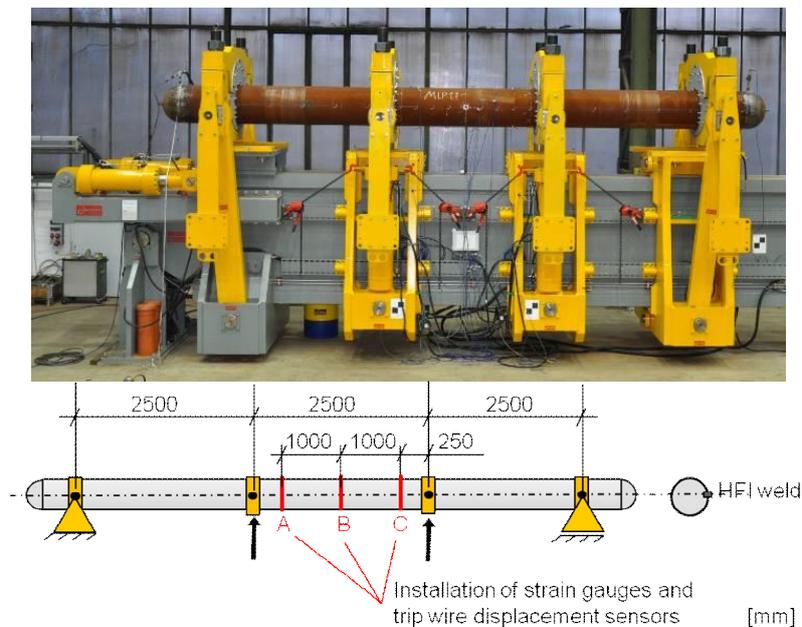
Four-point bending test at SZMF and schematic test pipe installation and instrumentation (pipe: HFI-welded, grade API X70, OD x t: 609.6 x 10 mm)
